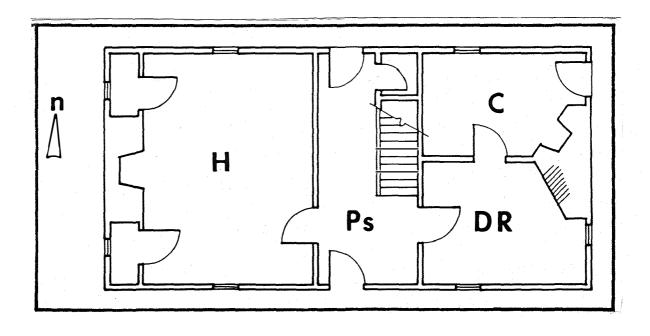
First-floor plan of Billups House, Mathews County (Upton 1986:317).
